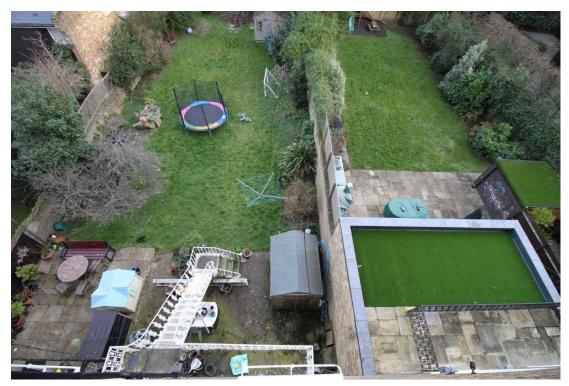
Top view from 42 Parkhill Road showing existing patios and white staircase Existing single story 4.5M extension to No 40 Parkhill Road to the right hand side.
